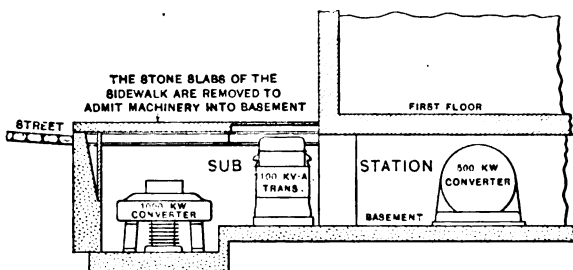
SECTIONAL ELEVATION, BASEMENT TYPE
